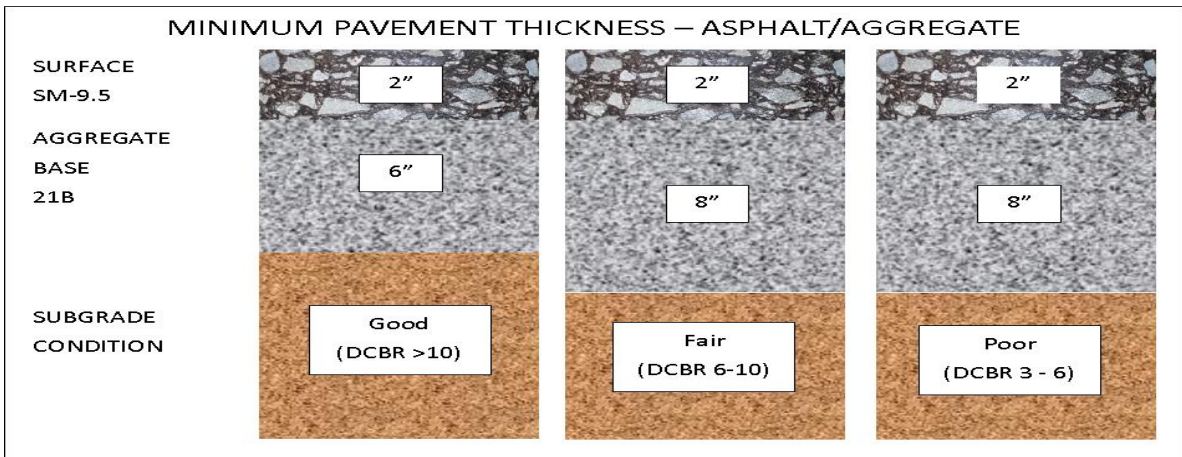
Asphalt with Aggregate Sub-Base Pavement (Parking Stall Areas)
